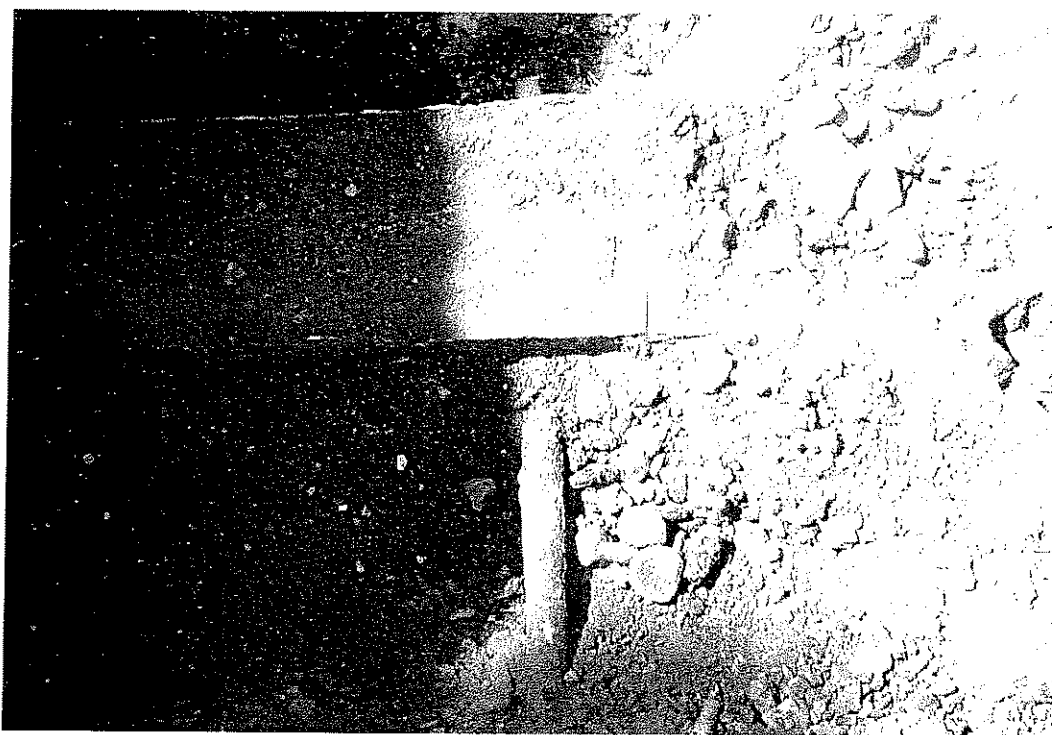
View of Typical Dockwall Configuration, Looking Southwest from Station 10+85.
